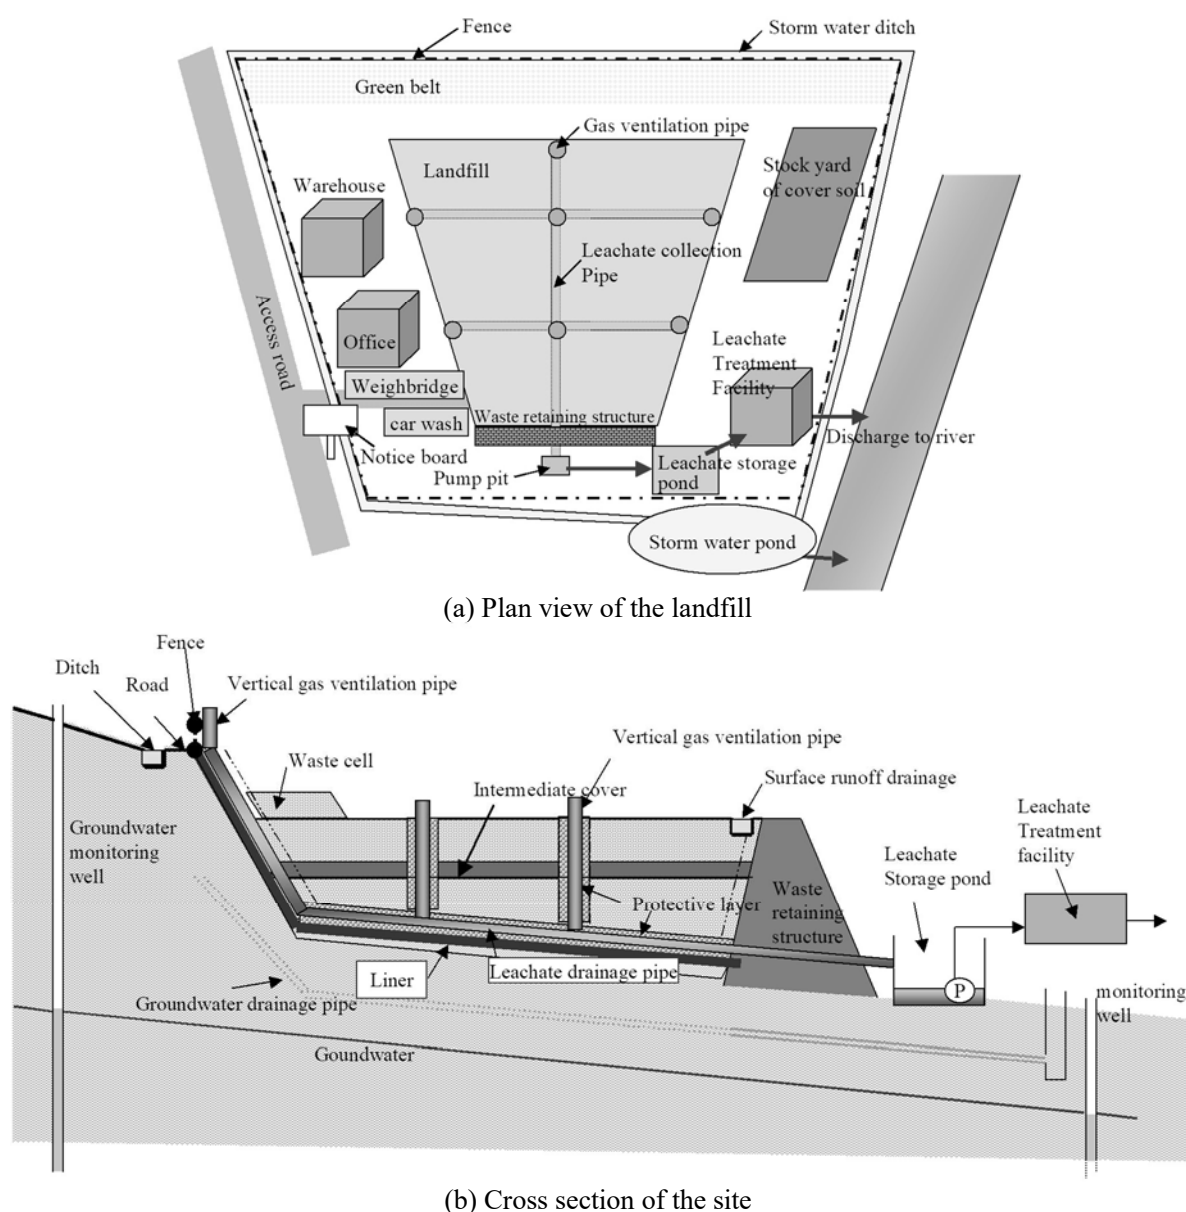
Plan view and cross section of the sanitary landfill and its basic infrastructure
